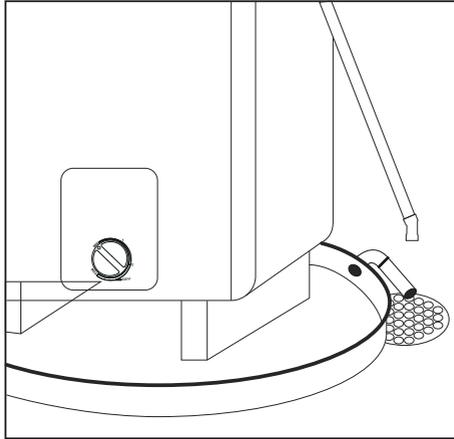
A suitable drain pan piped to an adequate drain can help protect flooring from leaks and drips.
